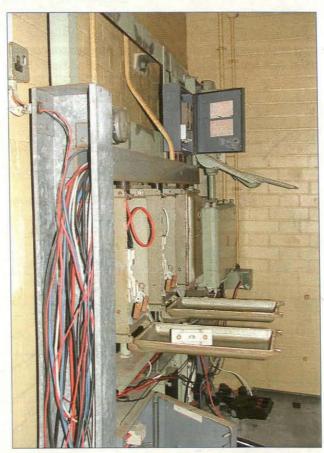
View of the remaining electrical equipment in the Electrical Intake Room, ground floor
